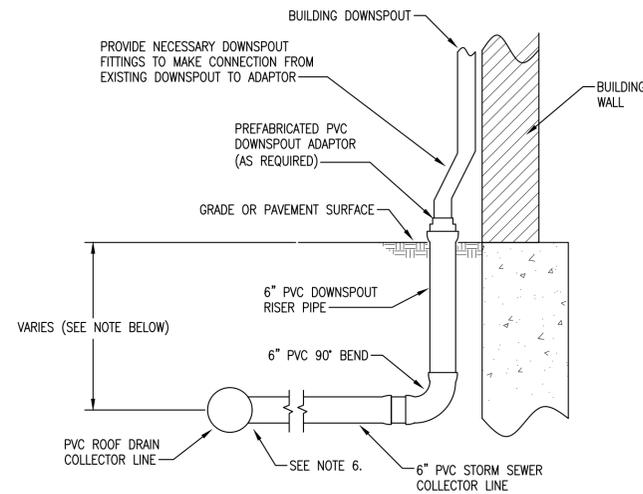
STANDARD ROAD PLAN SHEET 1 OF 1
